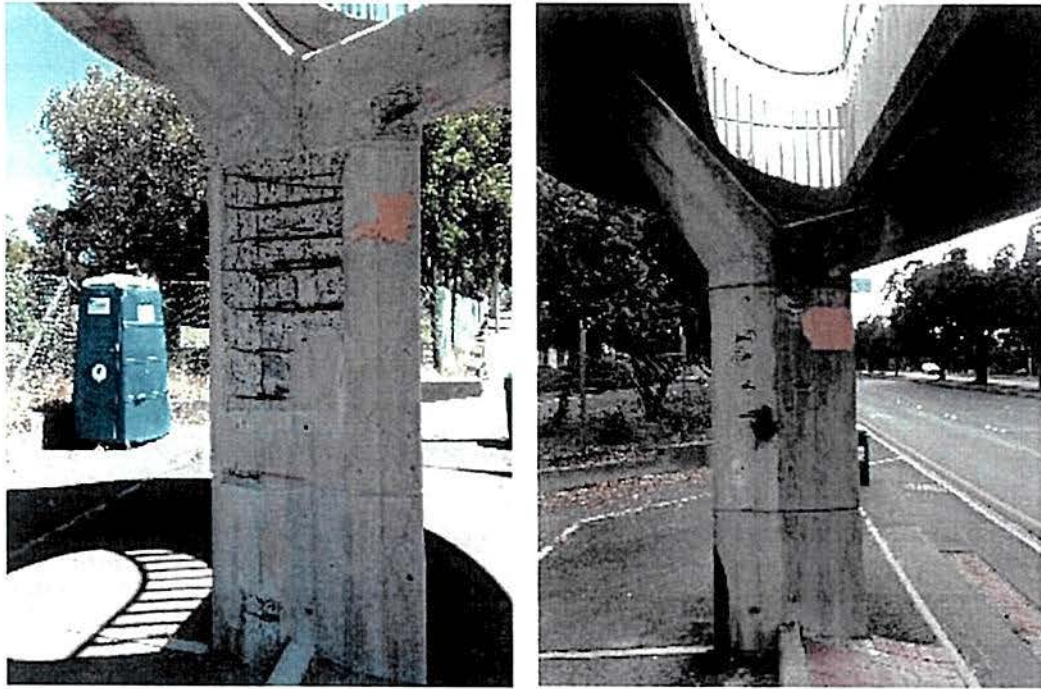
Mike Pienaar Footbridge before (right) and during concrete repair works (left) (2015).
